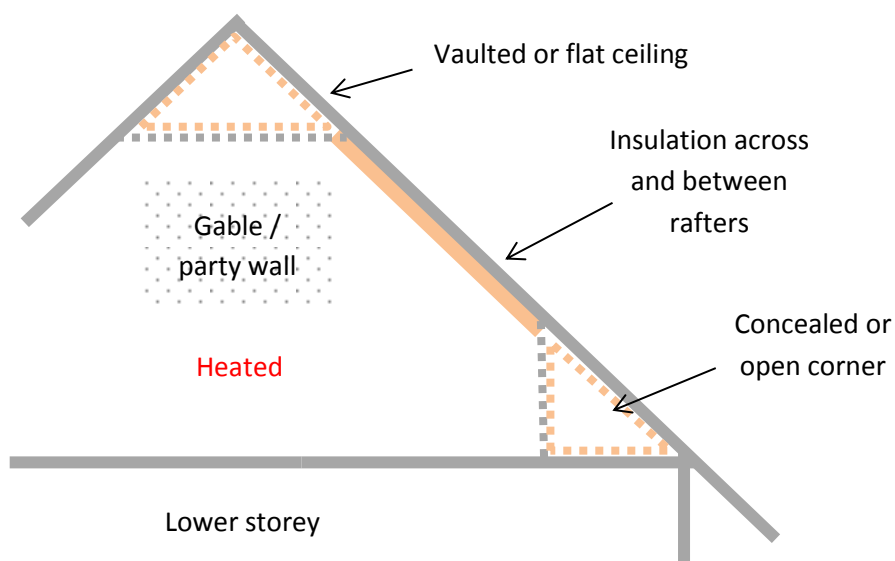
Cross-section showing basic elements of chalet roof construction with insulation
